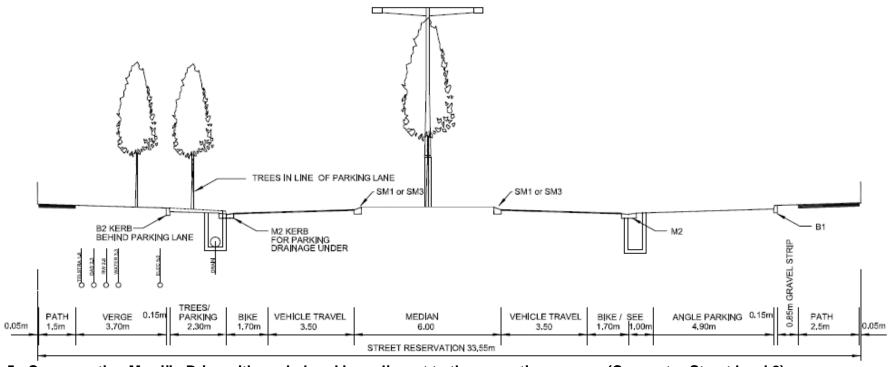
Cross section Merrijig Drive with angled parking adjacent to the recreation reserve (Connector Street level 2)
